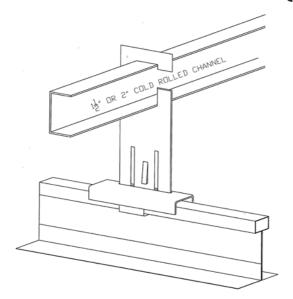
Flat Channel Beam Hanger Supporting Suspended Ceiling Main Runner
